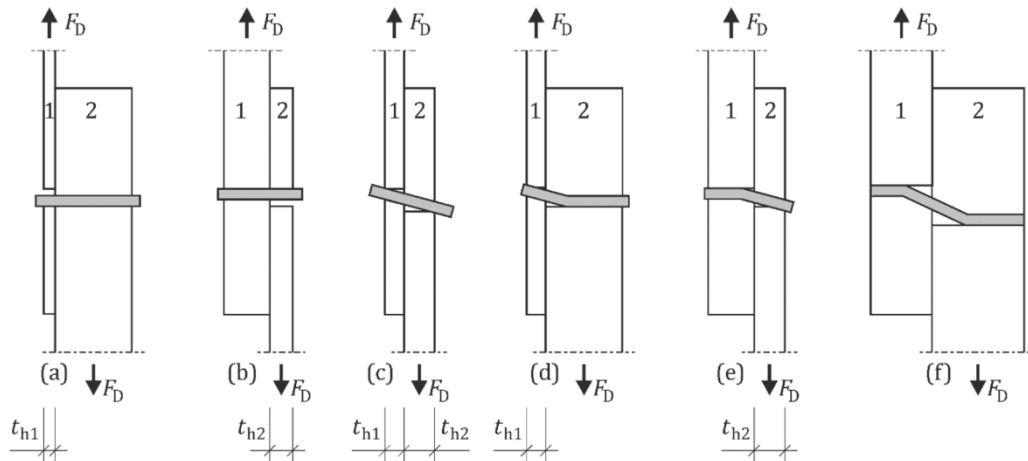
Failure modes of a dowel connecting two members (EN 1995)
